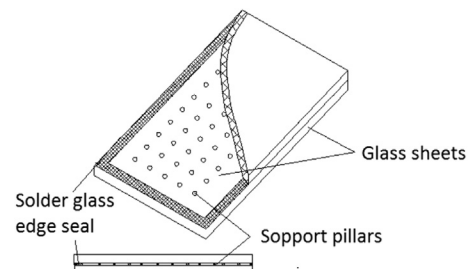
Schematic diagram of vacuum glazing with a fused edge seal.
